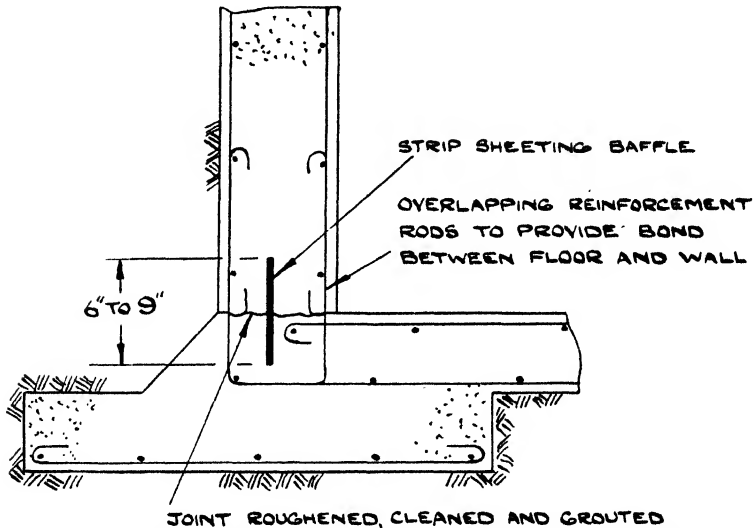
CONSTRUCTION JOINT AT BASE OF WALL TO REINFORCED CONCRETE TANK
